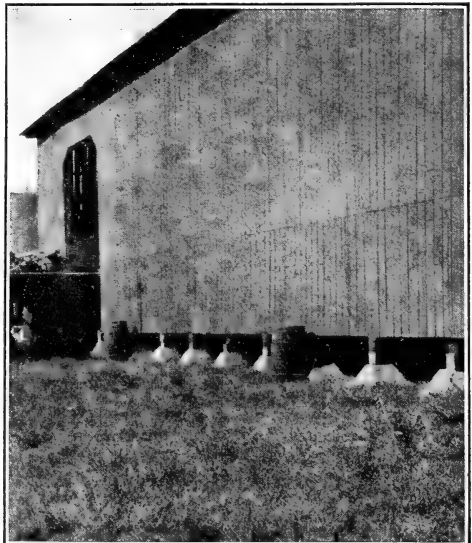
Large storage shed at Laurel, Miss., set on concrete piers, high off the ground, with ample ventilation from all sides. This is the best type of construction.
